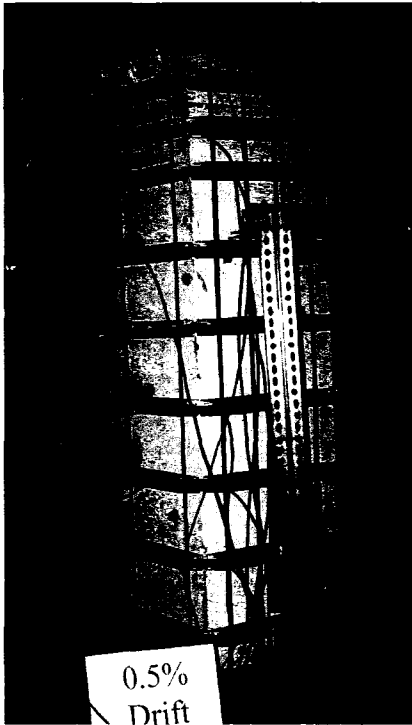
Anchorage slip at the column footing interface for column SR-C
